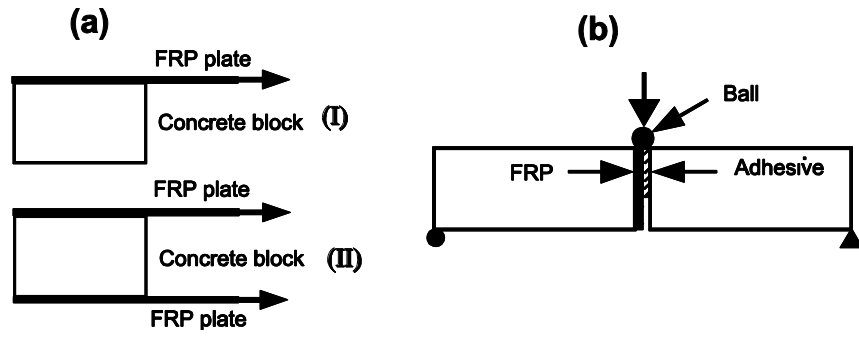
(a) (I) - single (II) - double shear lap specimens (b) A modified three-point bend specimen
